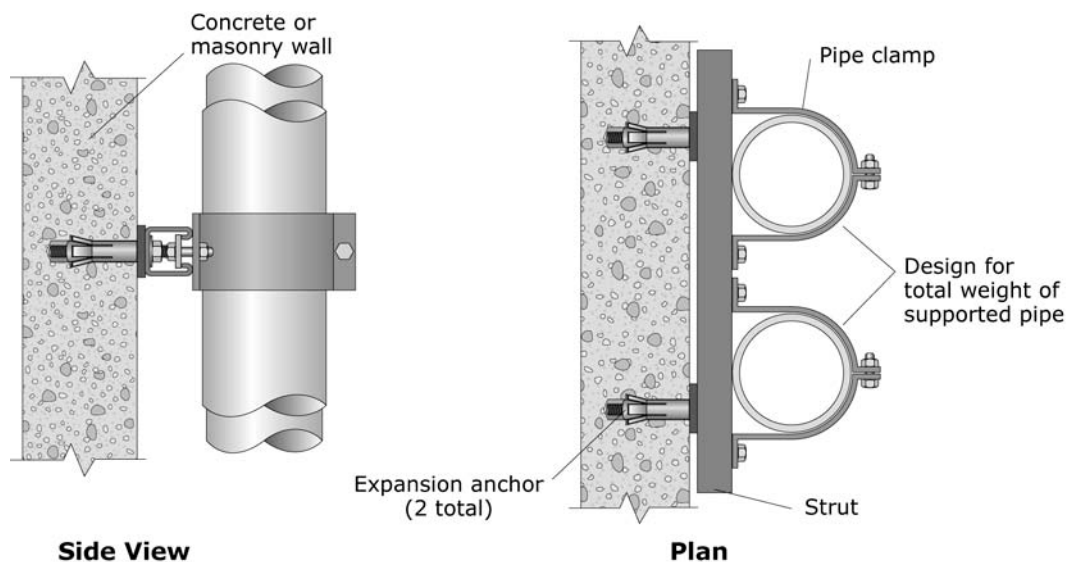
Surface-mount to structural wall (ER).
